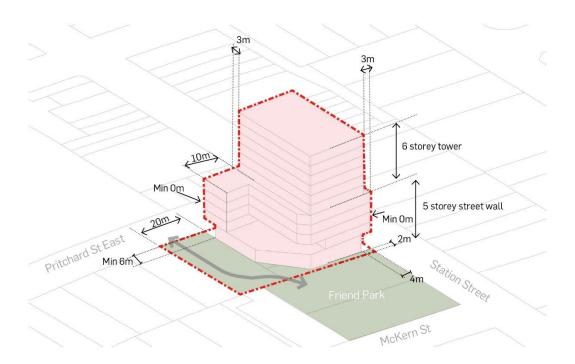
Figure J- Corner of Pritchard Street and Station Street Precinct – 3D Conceptual Diagram – east-west section
